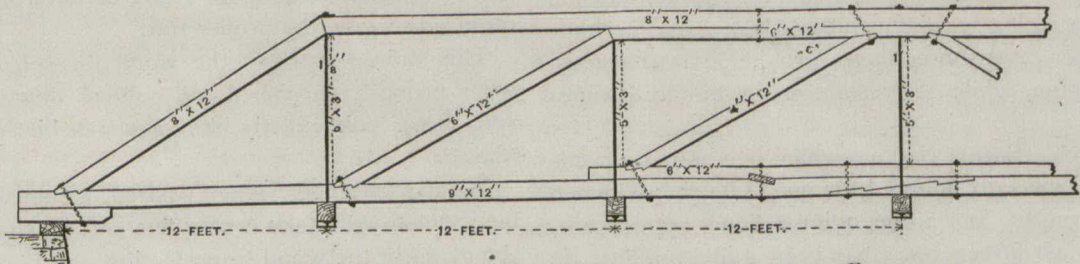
BRIDGE TRUSS, SIDE ELEVATION. SCALE 1/8 INCH TO FOOT.
